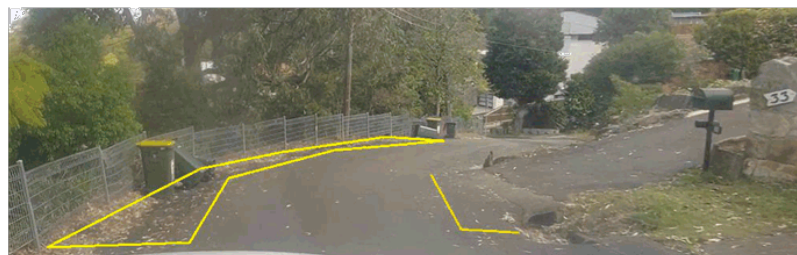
Chainage 300. The asphalt strip on the left-hand side does not appear to be full-depth pavement. This should be reconstructed as a deep lift to ensure it is strong enough to bear the load of waste collection trucks.
